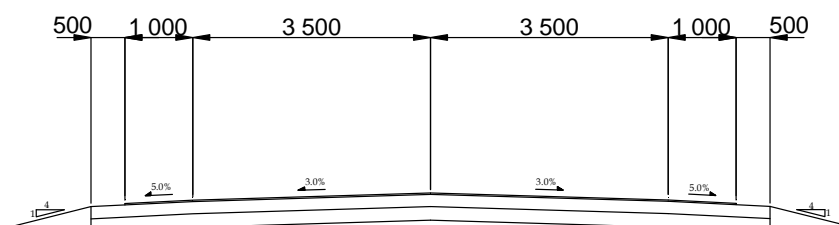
Typical Cross Section of Nampula – Nacala Road (Normal Section)
